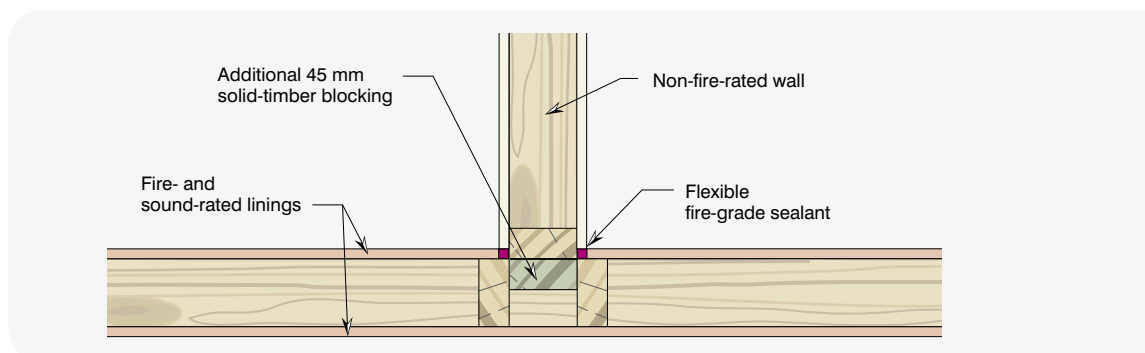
Non-rated wall abutting fire-rated wall using timber blocks – FRL 60 minutes – plan view.
